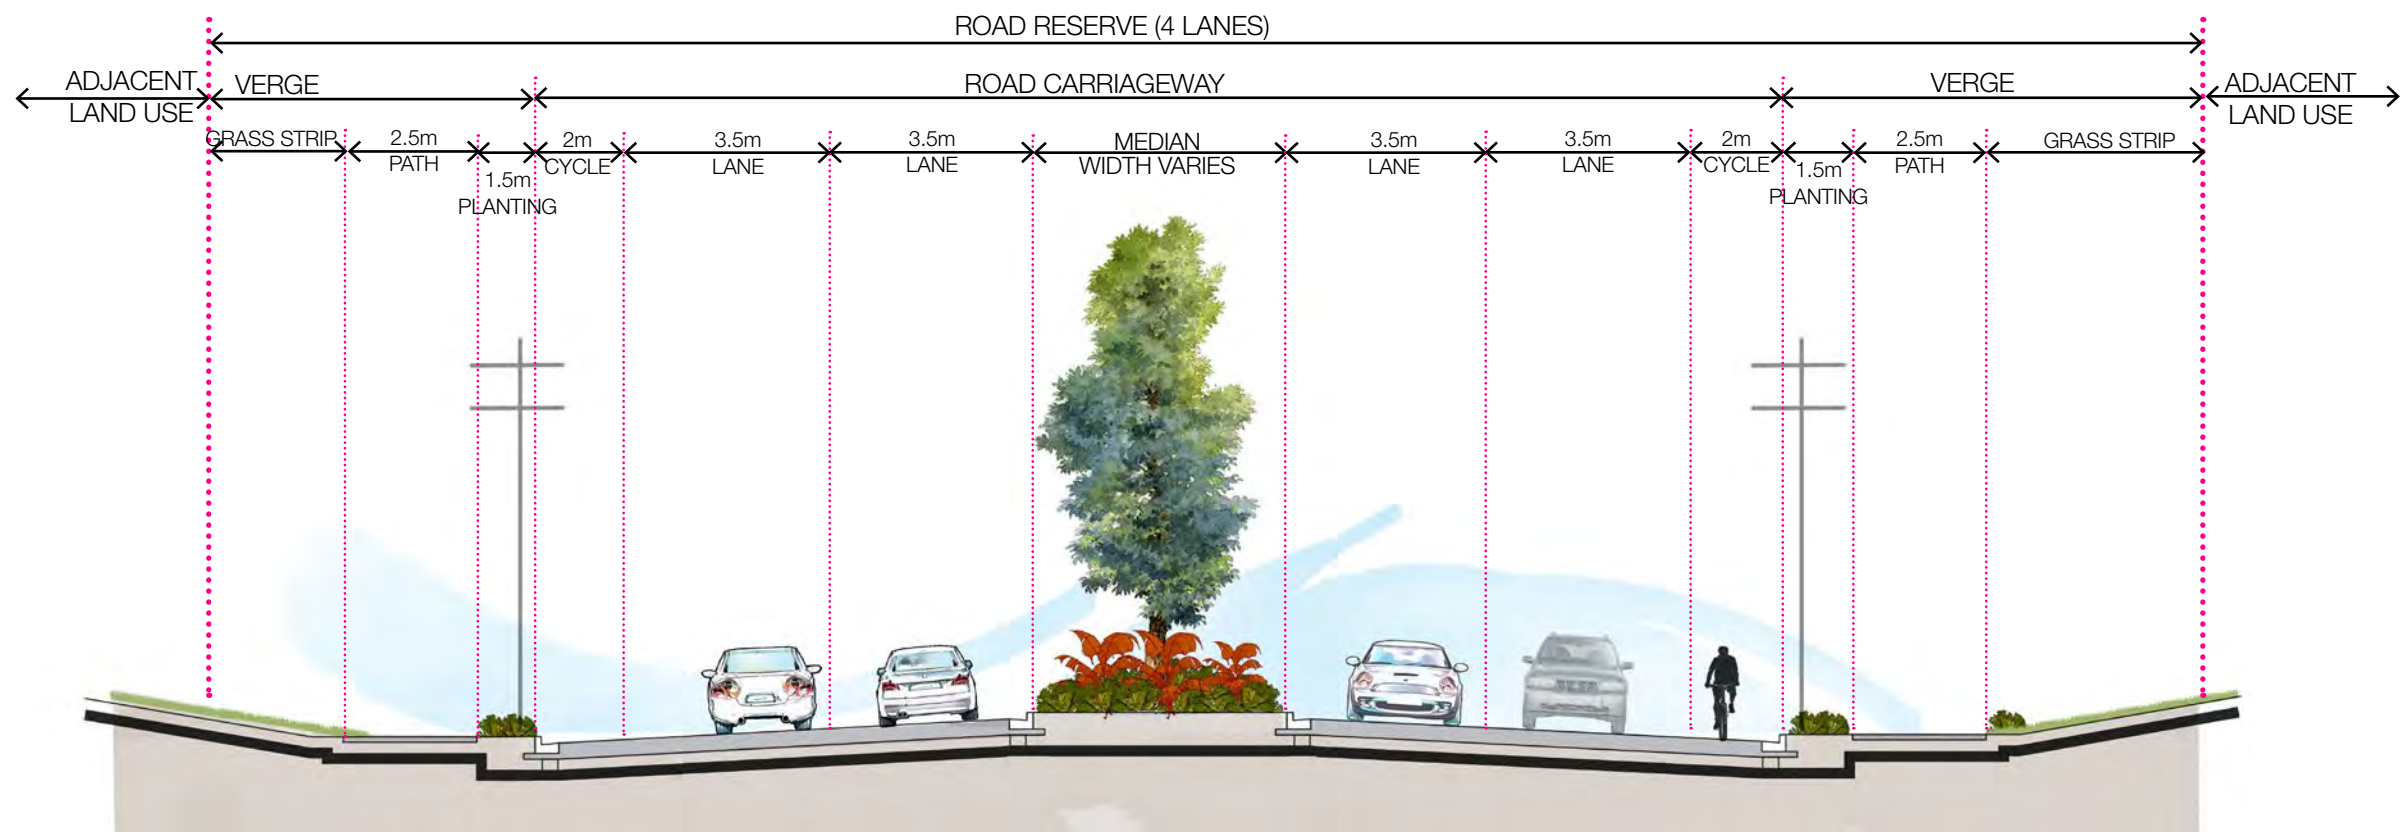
Arterial road cross section in urban (core) setting, road corridor width varies between 30 to 40m
